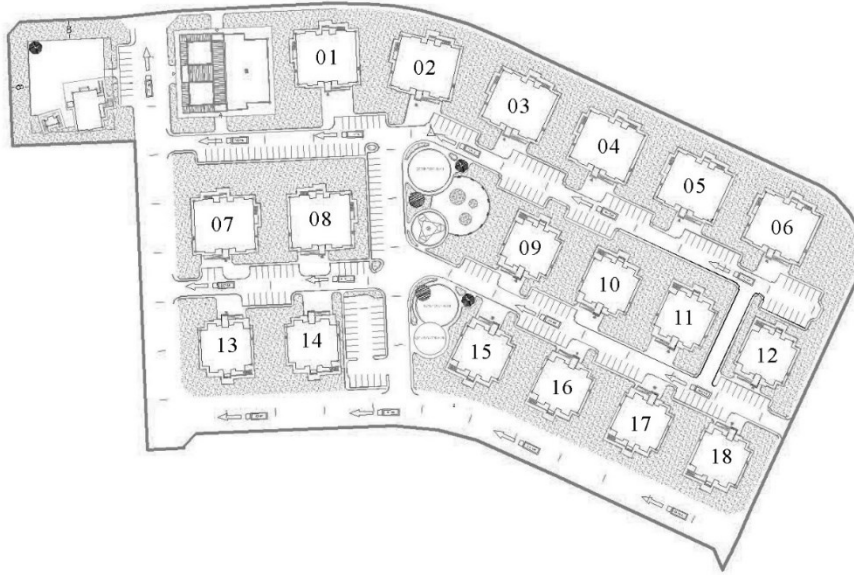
Site layout planning of TOKI Şahinbey.
